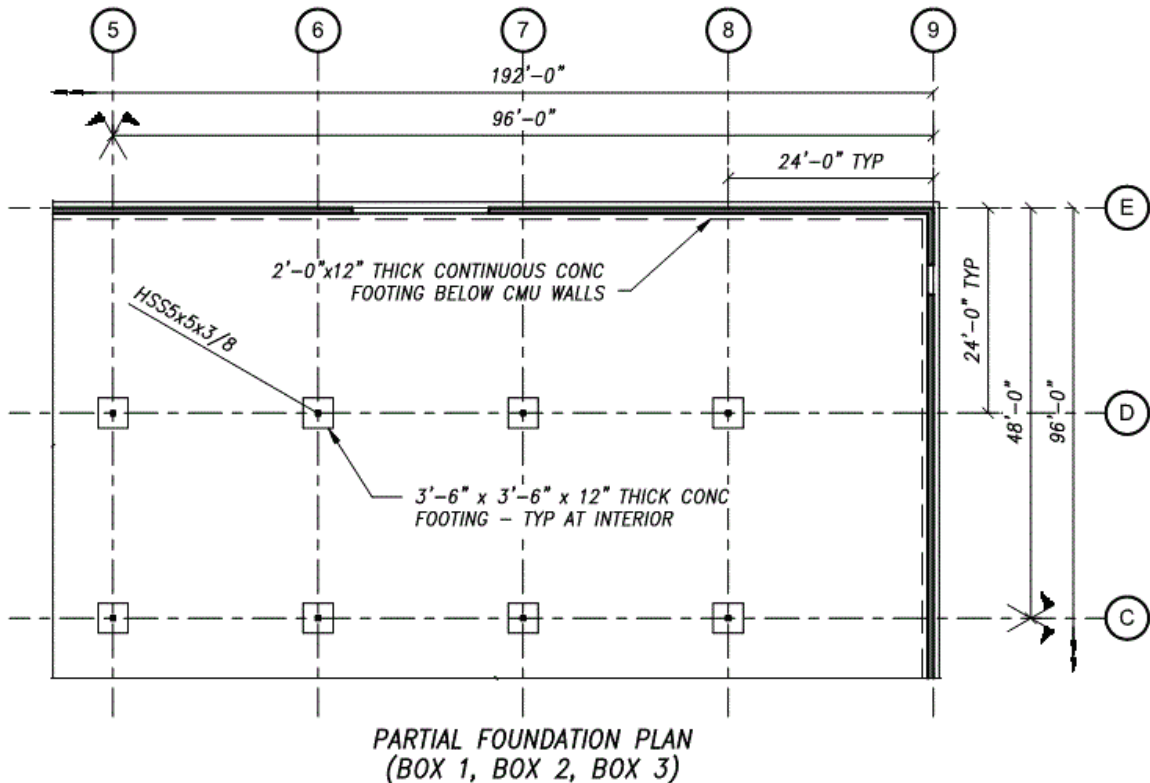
Single-story retail/industrial/warehouse building foundation configuration: BOX1, BOX2, BOX3.
